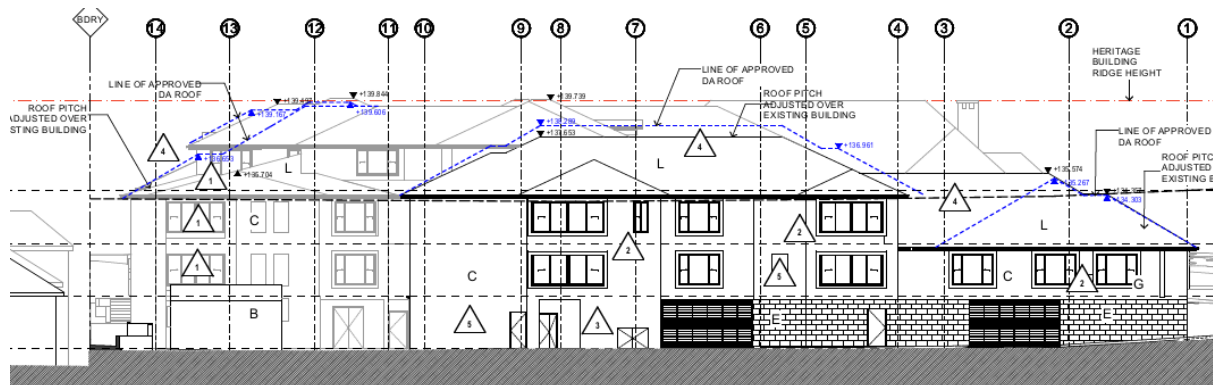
Extract of southern elevation showing approved roofline in blue, and amended roofline in grey
